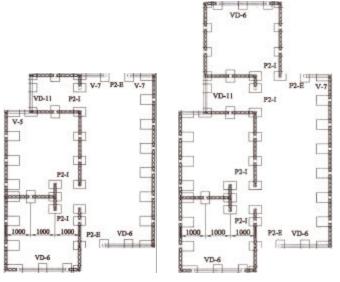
Models of the two alternative house types with living room, kitchen, bathroom and two or three bedrooms.
